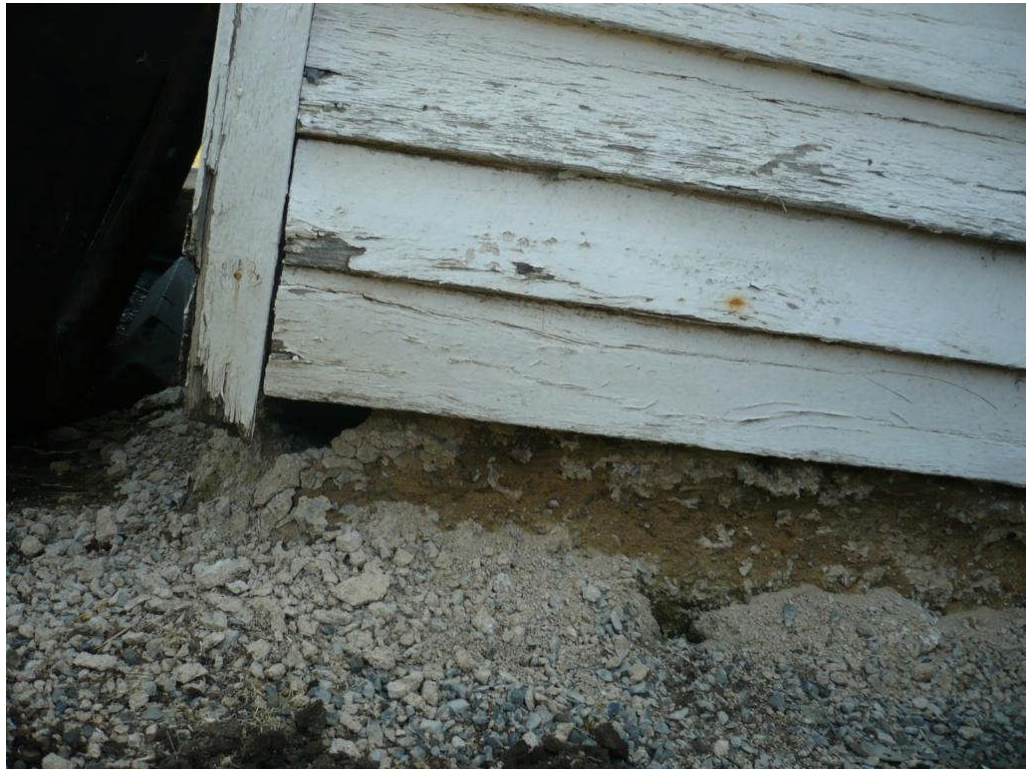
Deterioration of the Chemical Storage Shed Concrete Slab
